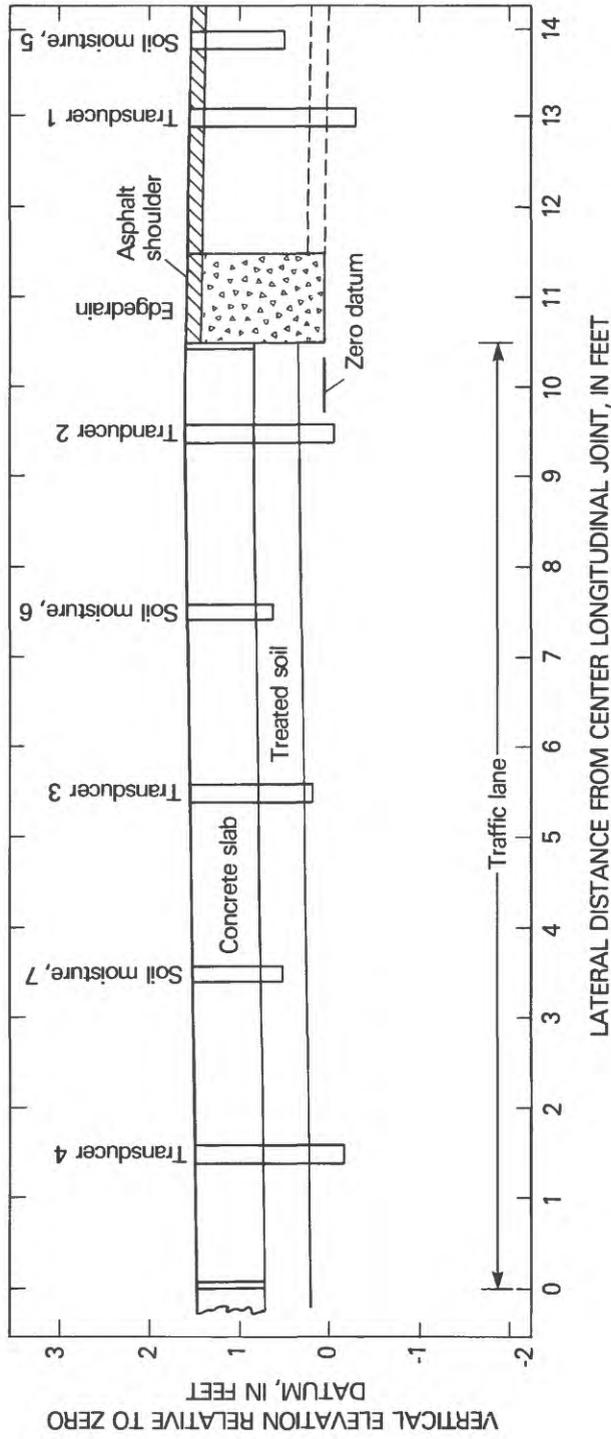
Cross-sectional view of Alabama site showing locations of sensors under pavement.
